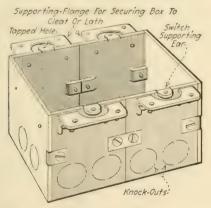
Metallic flush switch-box for a two-gang installation.
